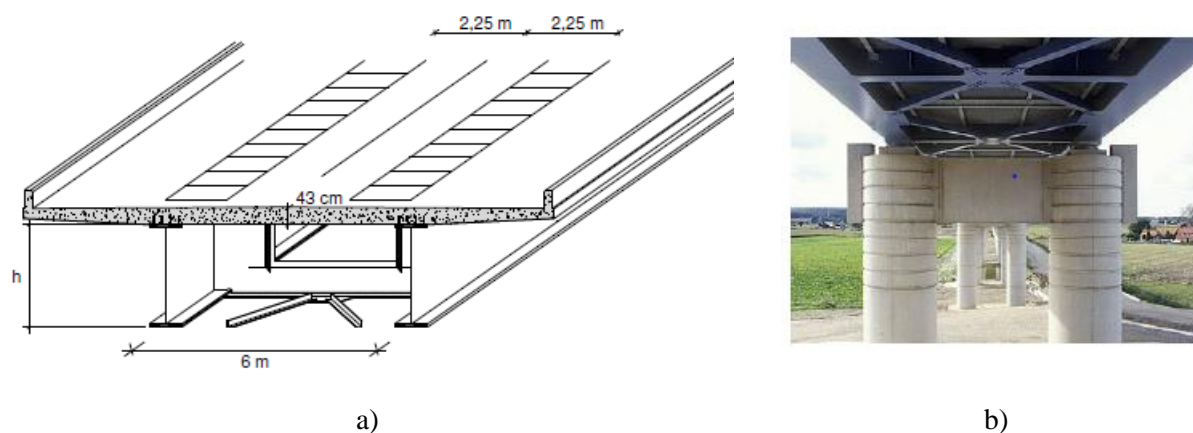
Composite steel-concrete railway viaduct: a) typical cross-section; b) bottom view of the *Haute-Colme* viaduct (Figueiredo 2007)
